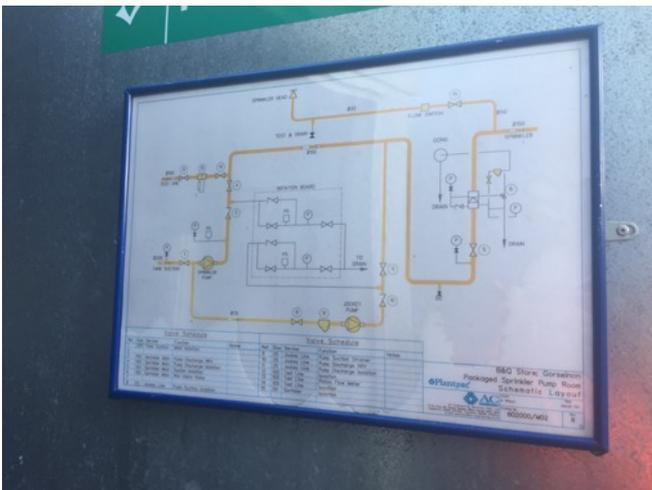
Detail of the sprinkler system's schematic layout drawing on display adjacent to the tank. The drawing pre-dates Poundstretcher's operations at the site and is labelled as serving the previous B&Q builders' merchants store on the site.
